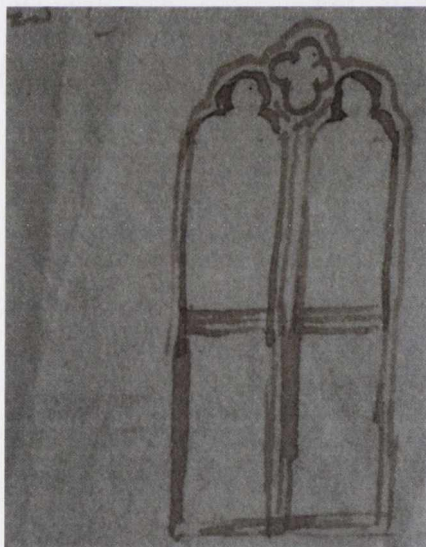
Chepstow Castle, detail of 'window over the kitchen and in the court', Laurence Parsons, n.d., Rosse papers, O/14/5.
